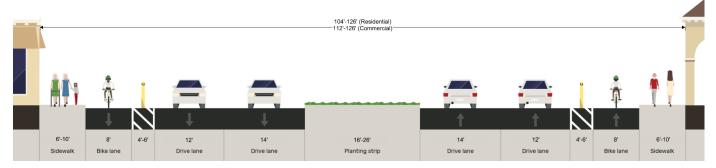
Proposed Typical Section for Primary Arterial (Bicycle Lane with Raised Buffer)
